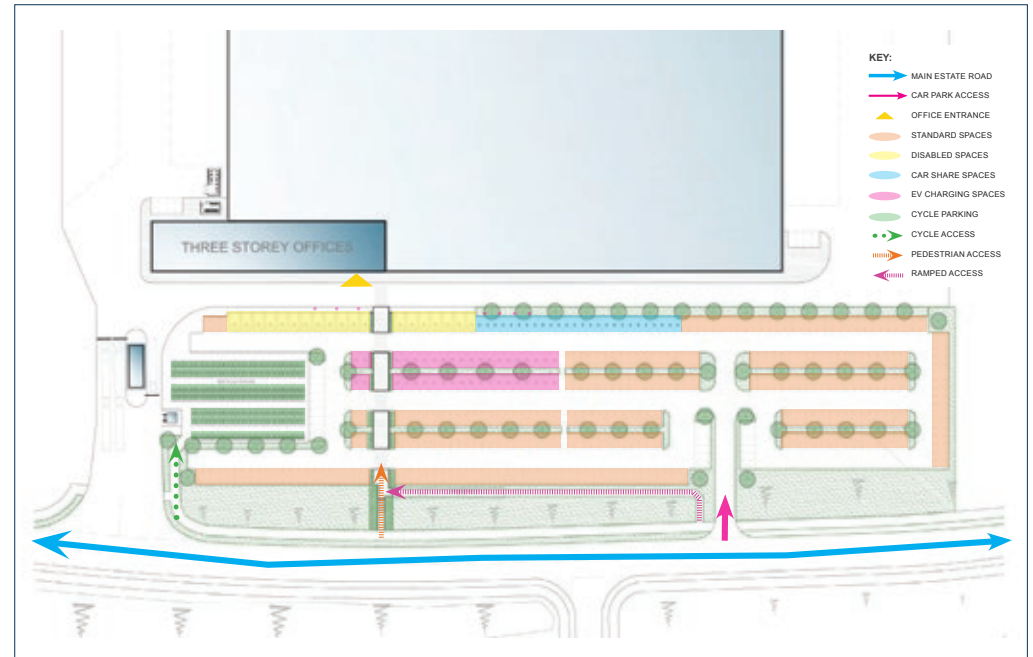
ILLUSTRATIVE SITE PLAN - CAR PARKING
